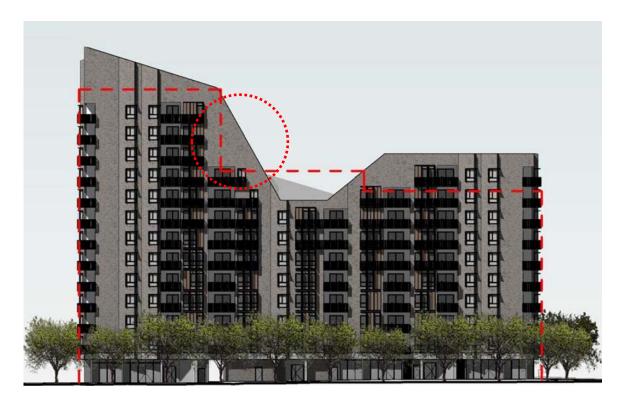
Original western elevation (dotted red line indicates original Stage 1 DA envelope)
